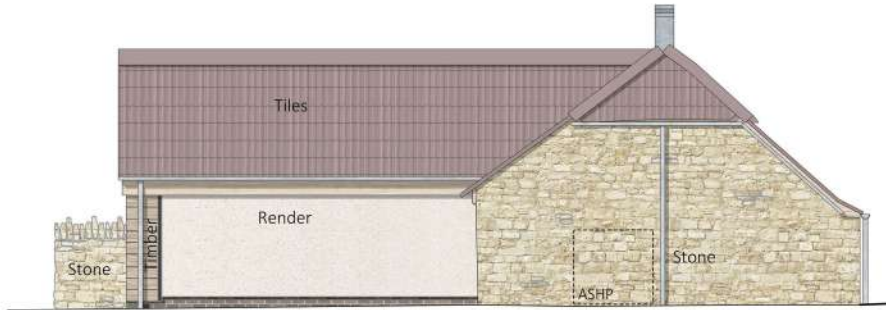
PROPOSED EAST ELEVATION, (NTS)
